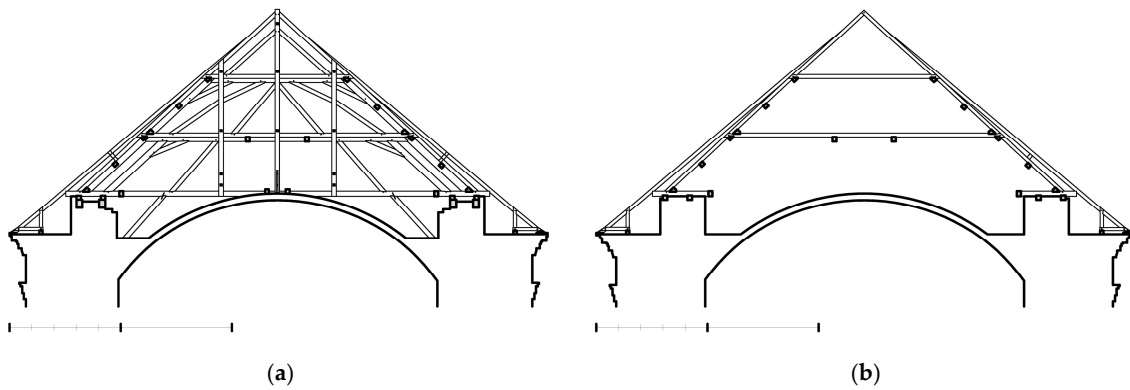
Timișoara Dome roof trusses: (a) main truss; (b) secondary truss.
